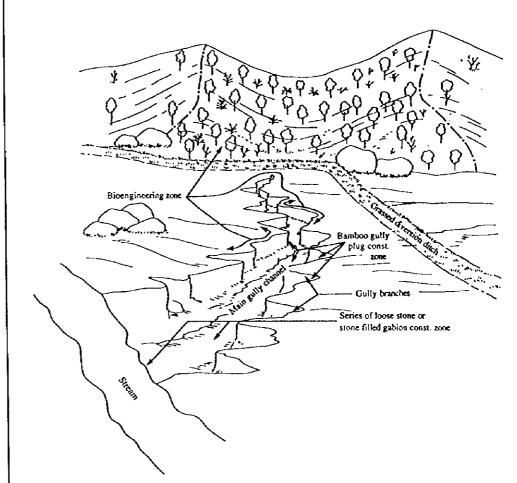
Gully Control with Bioengineering Work and Simple Structural Work (An Example)
